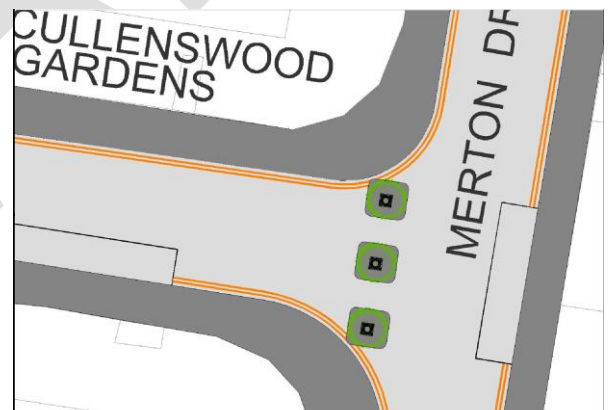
Filtered permeability feature providing restricted access Cullenswood Gardens
